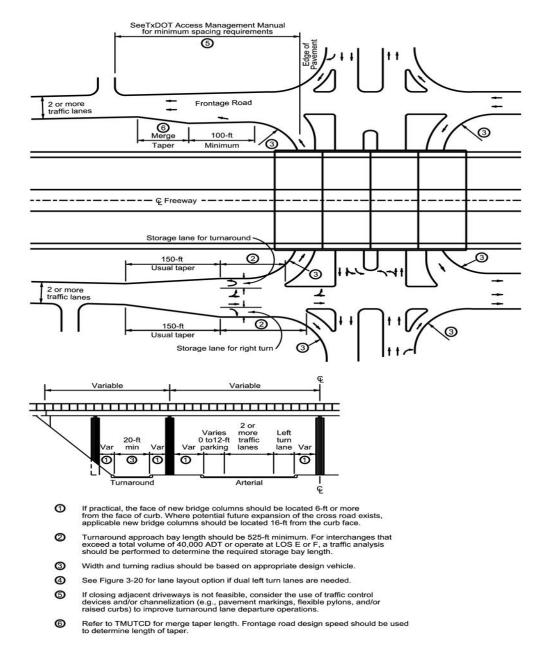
Typical Diamond Interchange with Frontage Road (Source: TxDOT Roadway Design Manual, Figure 15-33; p15-39)
